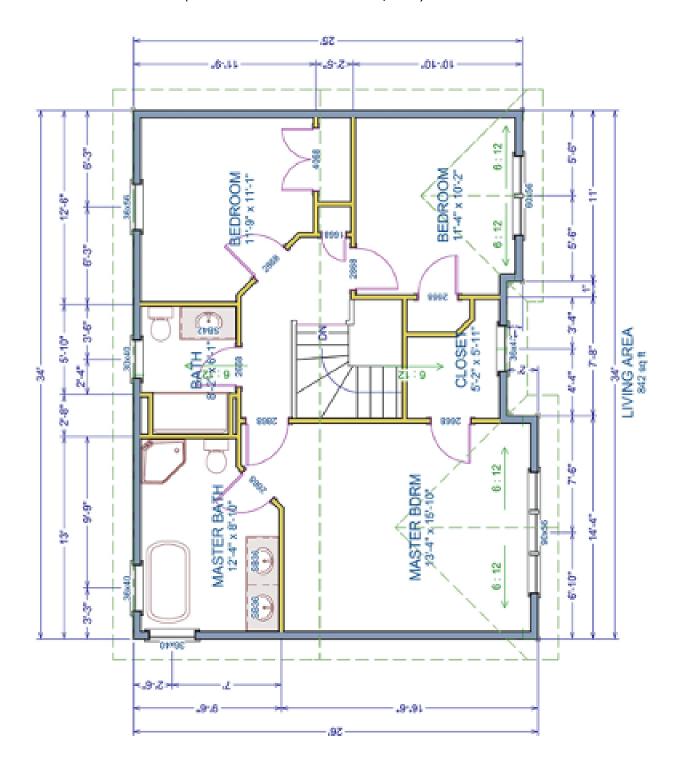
Second Floor Floor-Plan (Collins Homes & Renovations Ltd, 2021)
